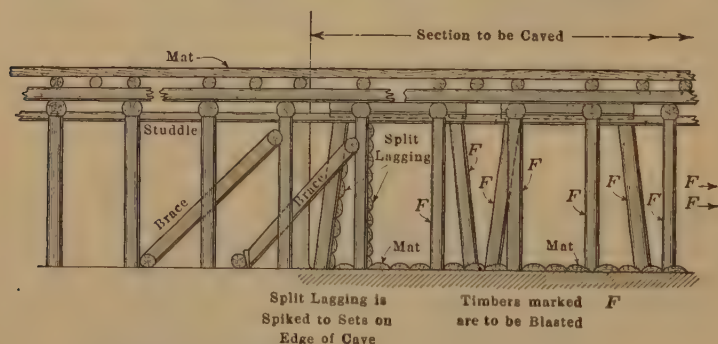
TIMBER BRACING FOR CAVING SETS.
